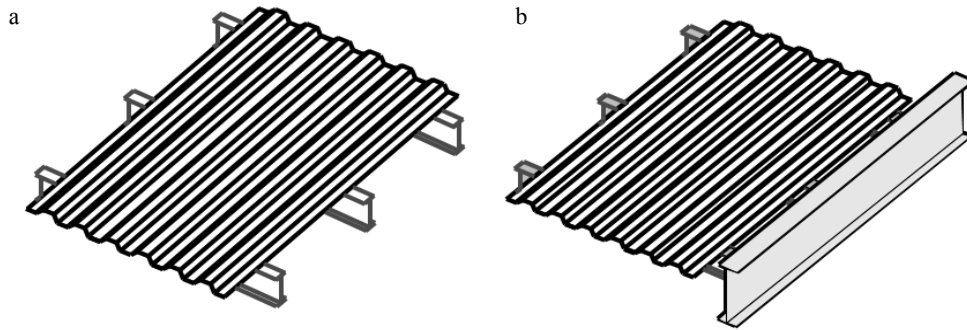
a – Steel beams supporting corrugated steel sheets; b – supporting beams rested on steel girders
